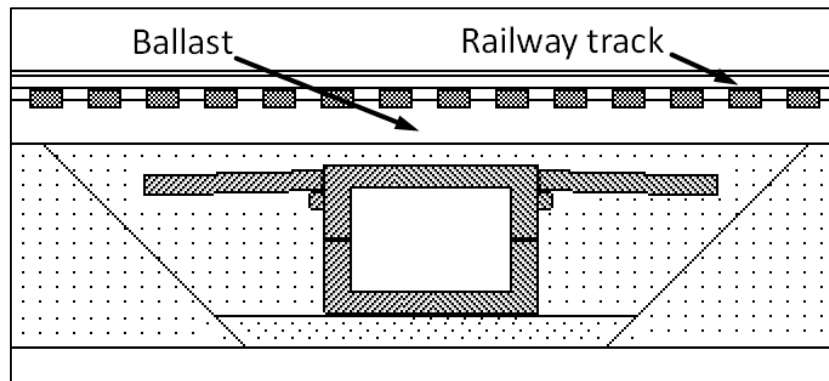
The minimum prerequisite set for all transition zones in this project, which is that the track must be founded on a continuous ballast bed over the bridge
